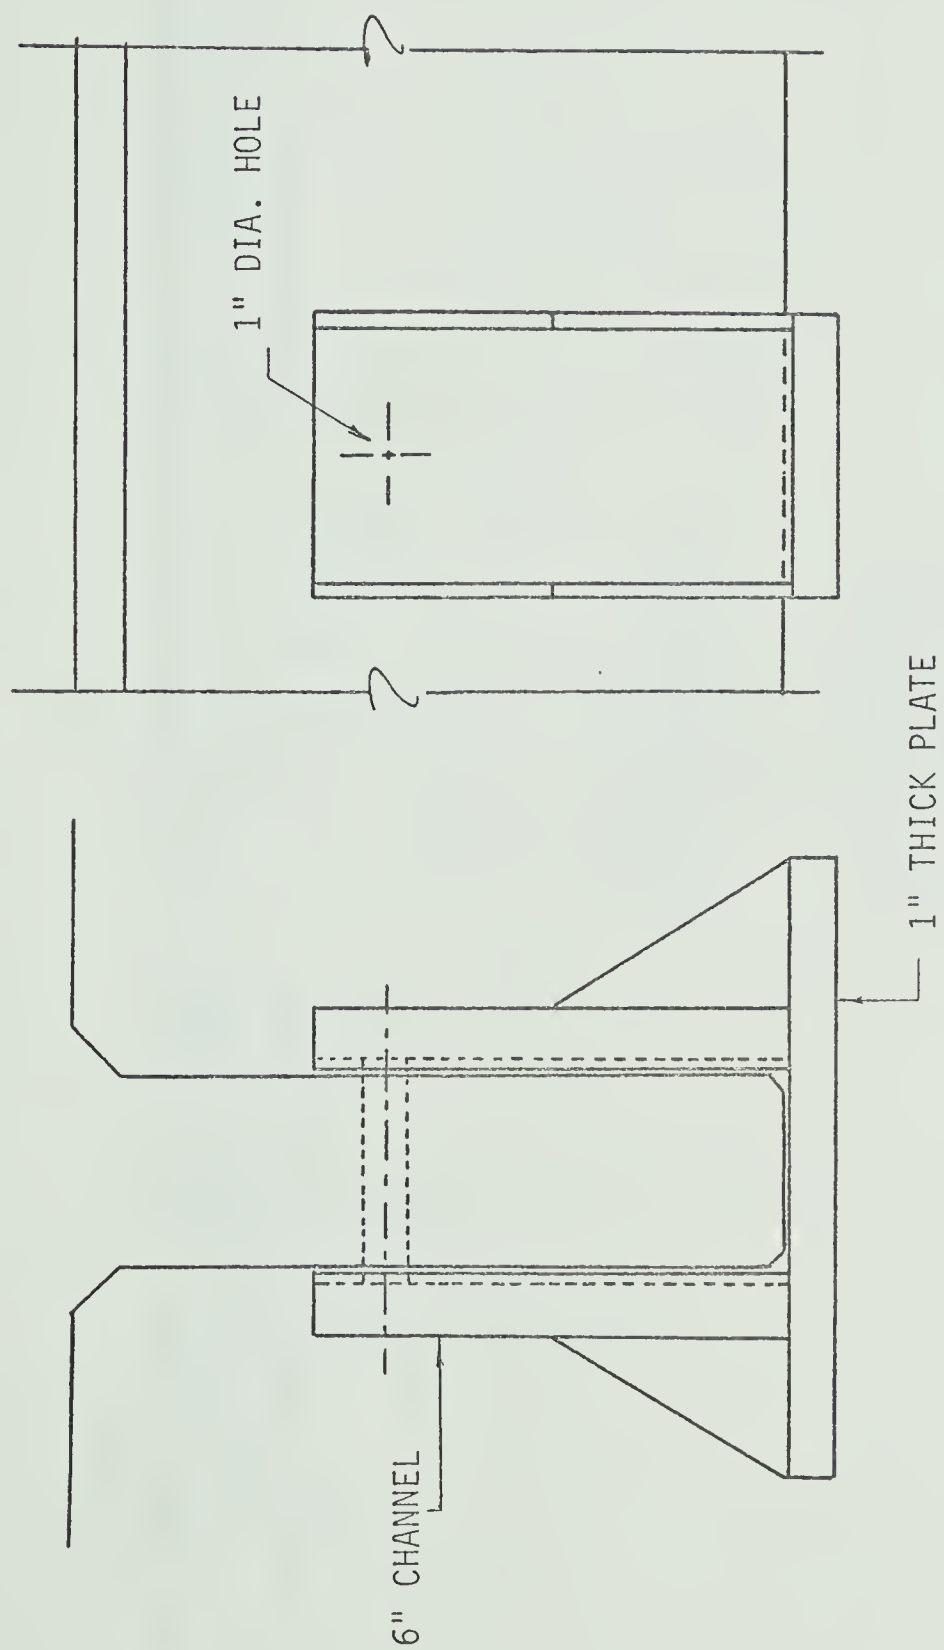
FRONT AND SIDE ELEVATIONS OF TYPICAL BEAM SEATS
